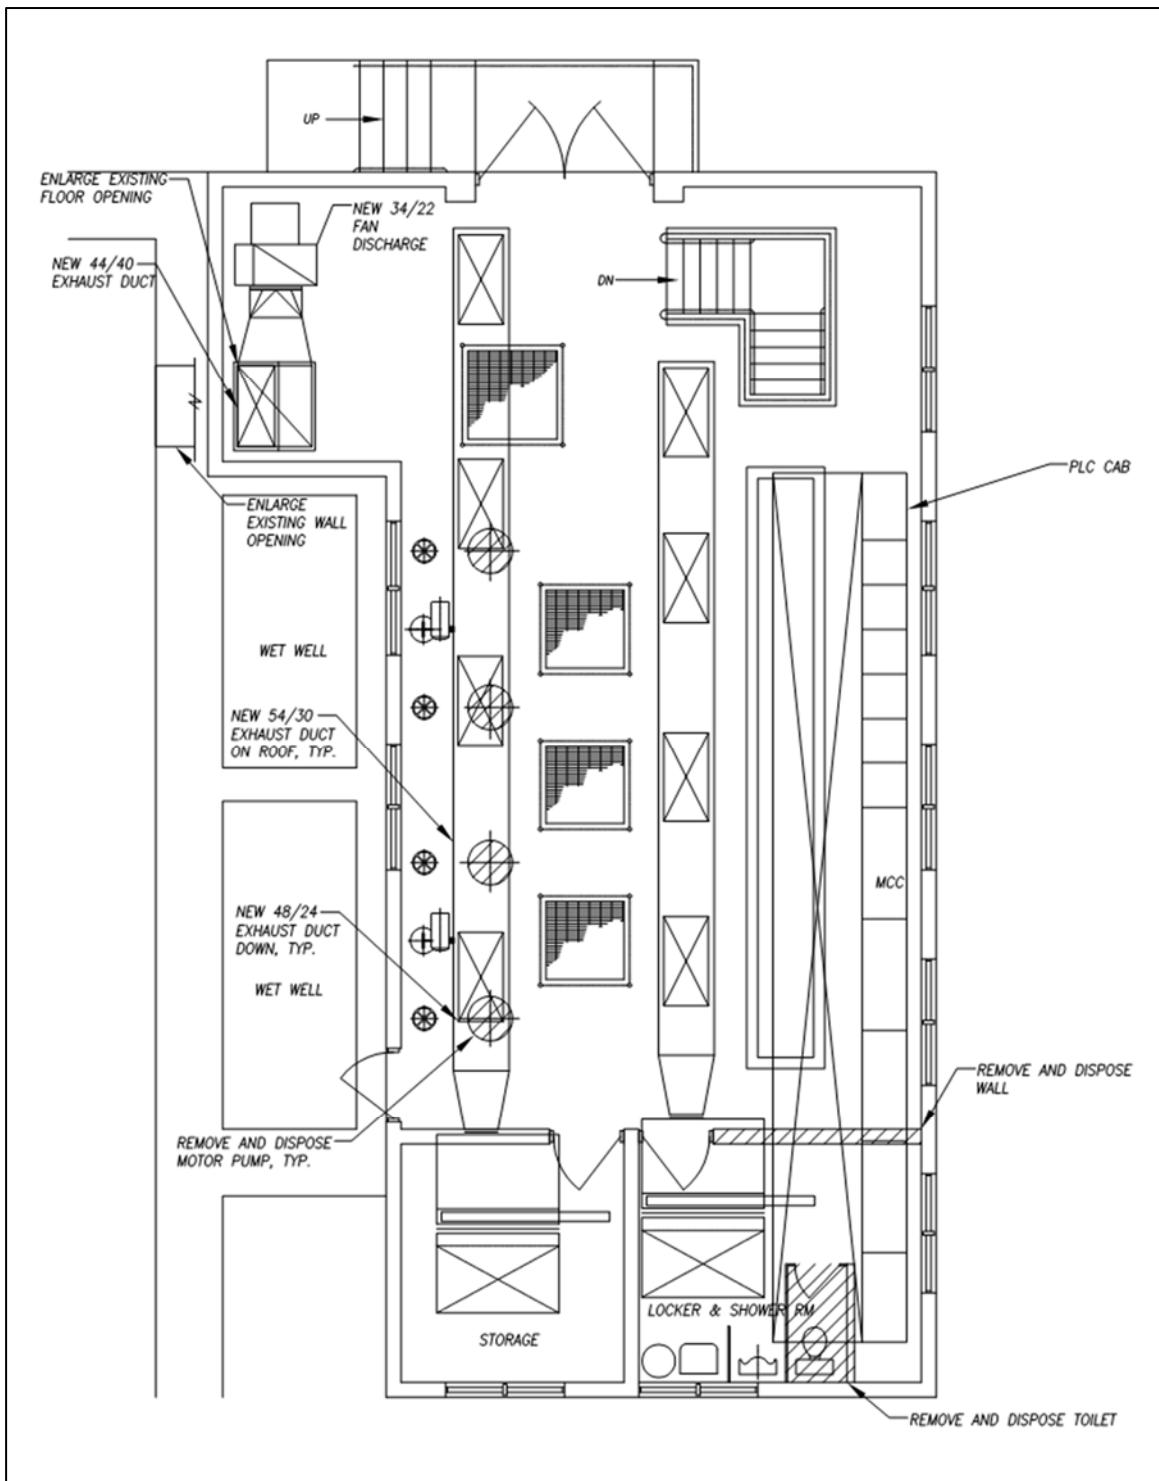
EPS with New Dry Pit Submersible Pumps (Variable Speed) – Ground Floor
